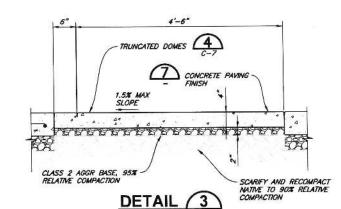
DETAIL (CONCRETE PAVING-PEDESTRIAN)
